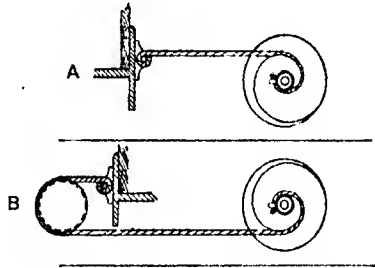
SCROLL AND CHECK SCROLL CONNECTIONS.
